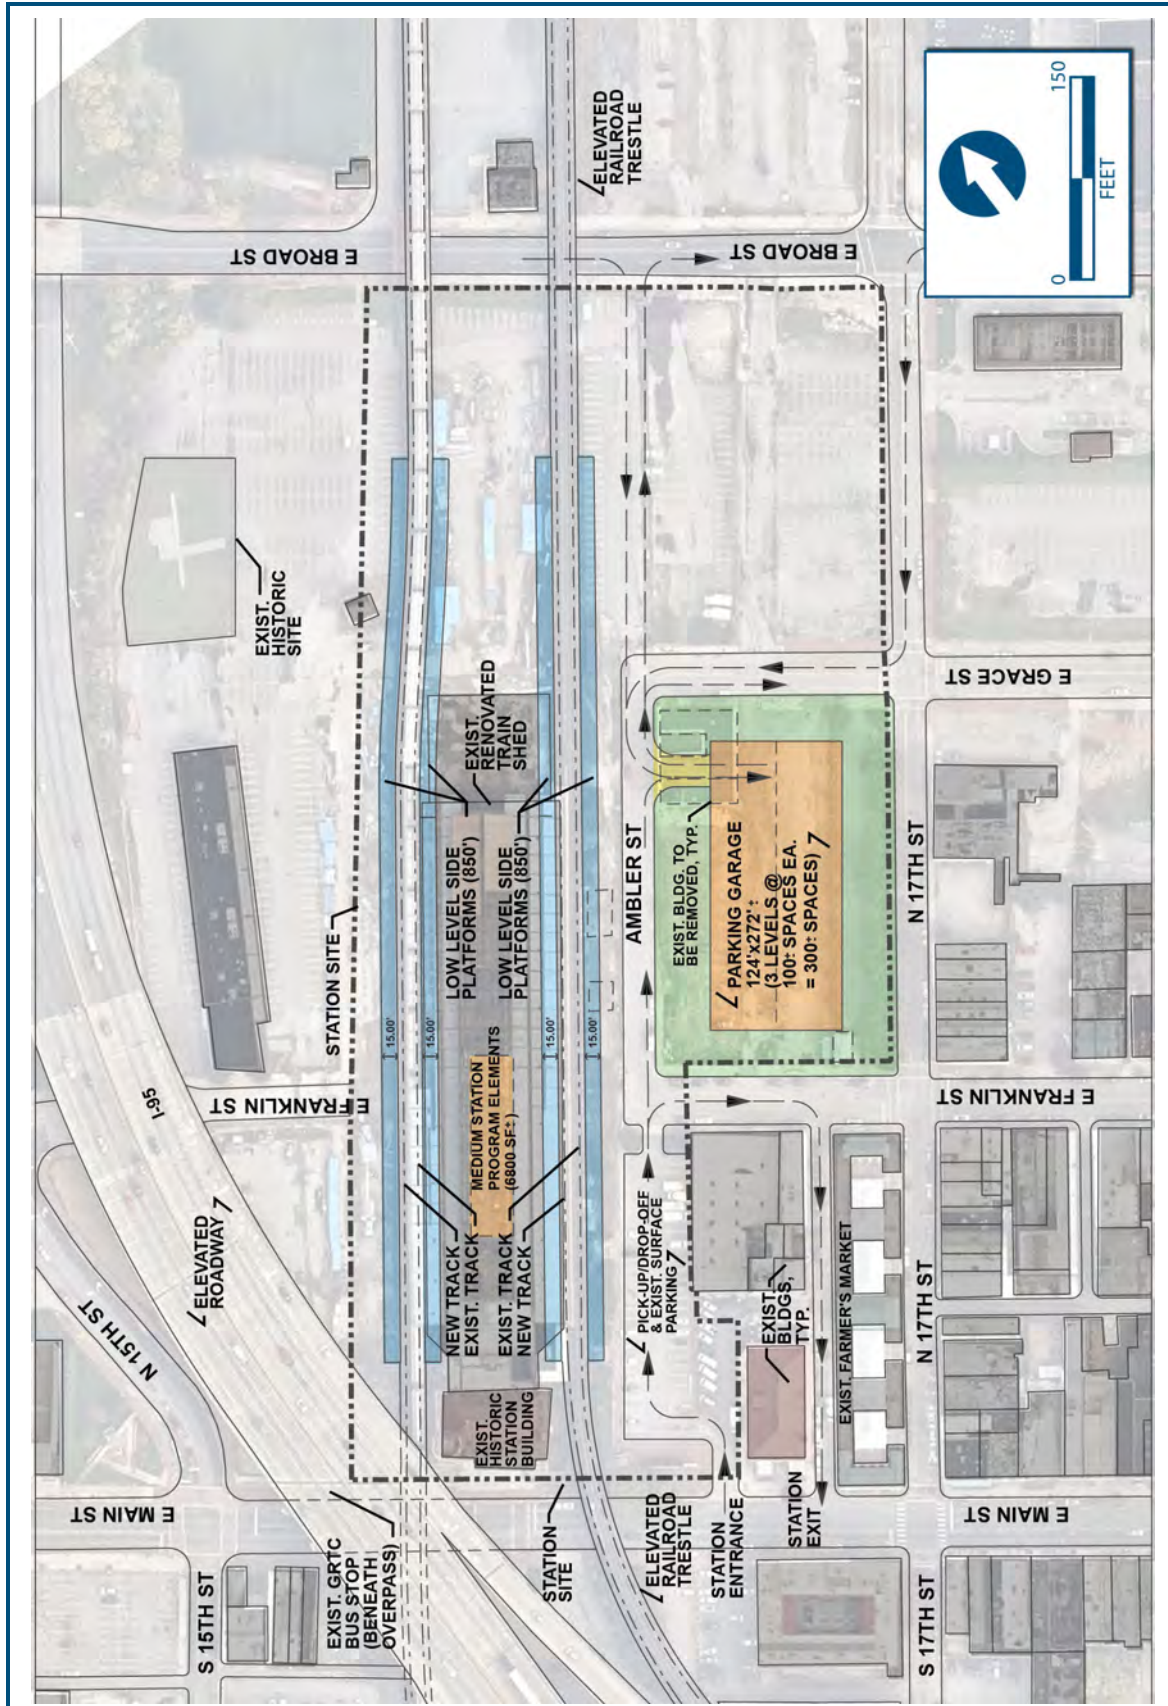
Main Street Station Improvements for Build Alternative 6F
